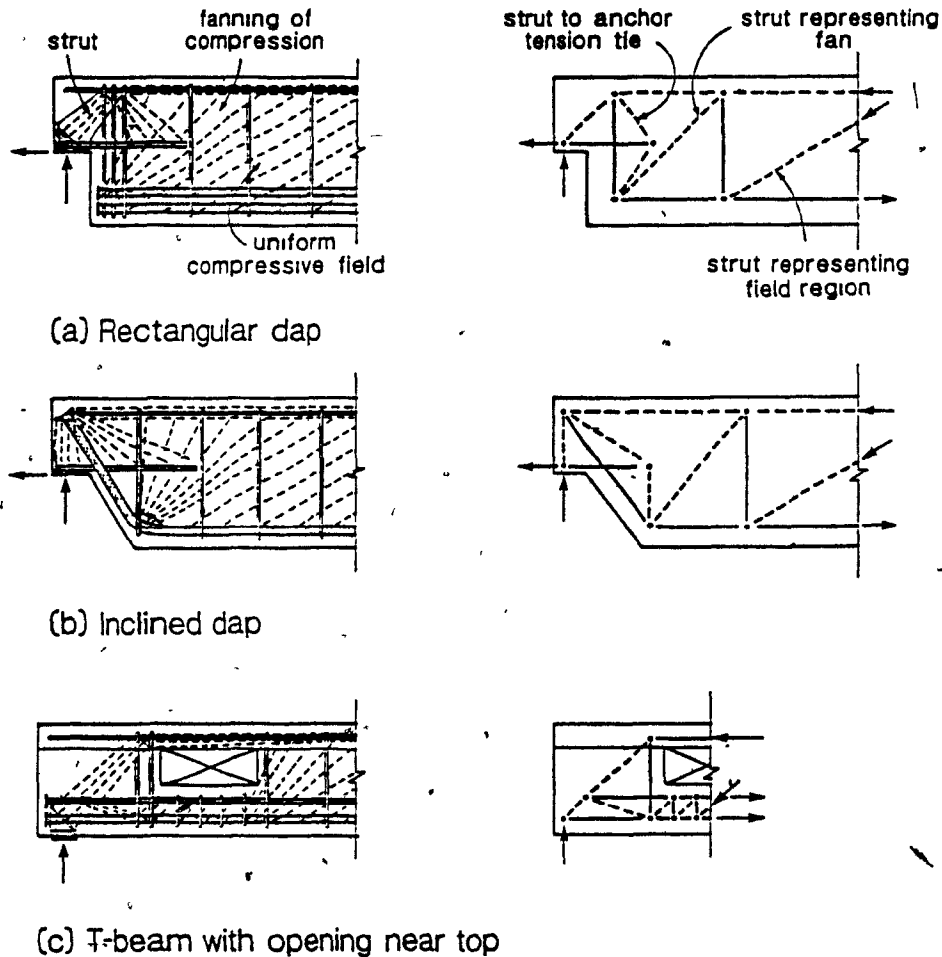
Strut and Tie Models and Truss Idealizations for Dapped End Beams and Beams with Holes in the Web.
